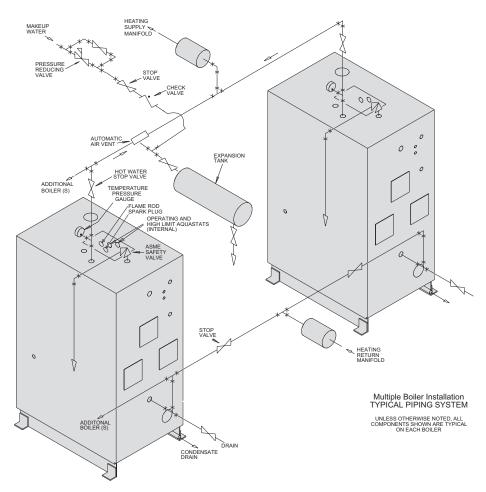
TYPICAL PIPING (MULTIPLE BOILER SYSTEM)
